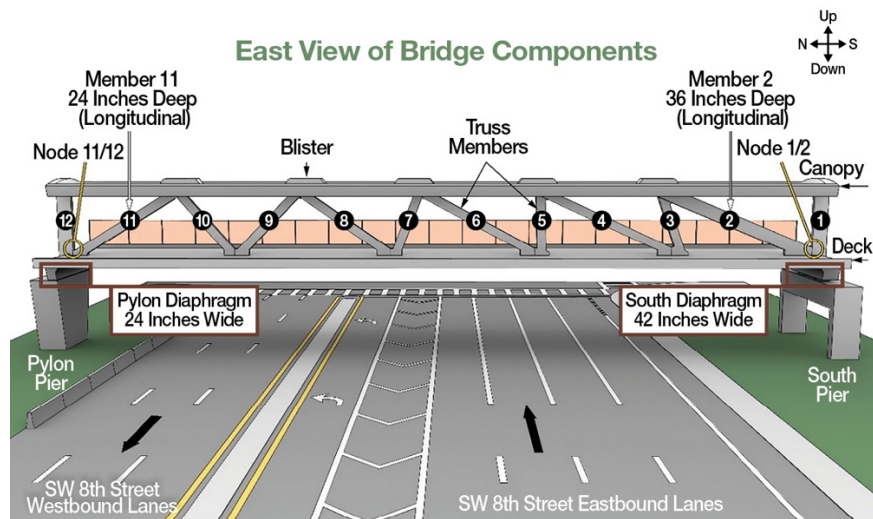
Cutaway view of bridge showing single truss, deck, and canopy.
